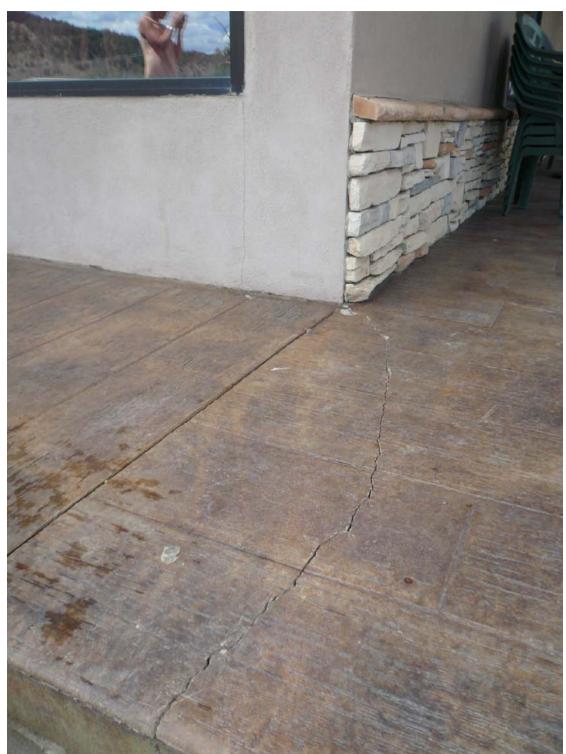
A five-foot-long crack in the concrete at the Big 4 Country Store in Valdez, CO.
